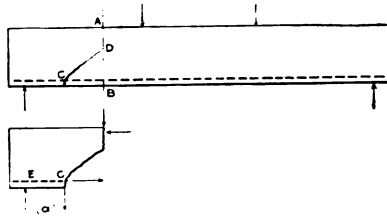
Failures When Bars Split Away from Upper Portion of Beam.
